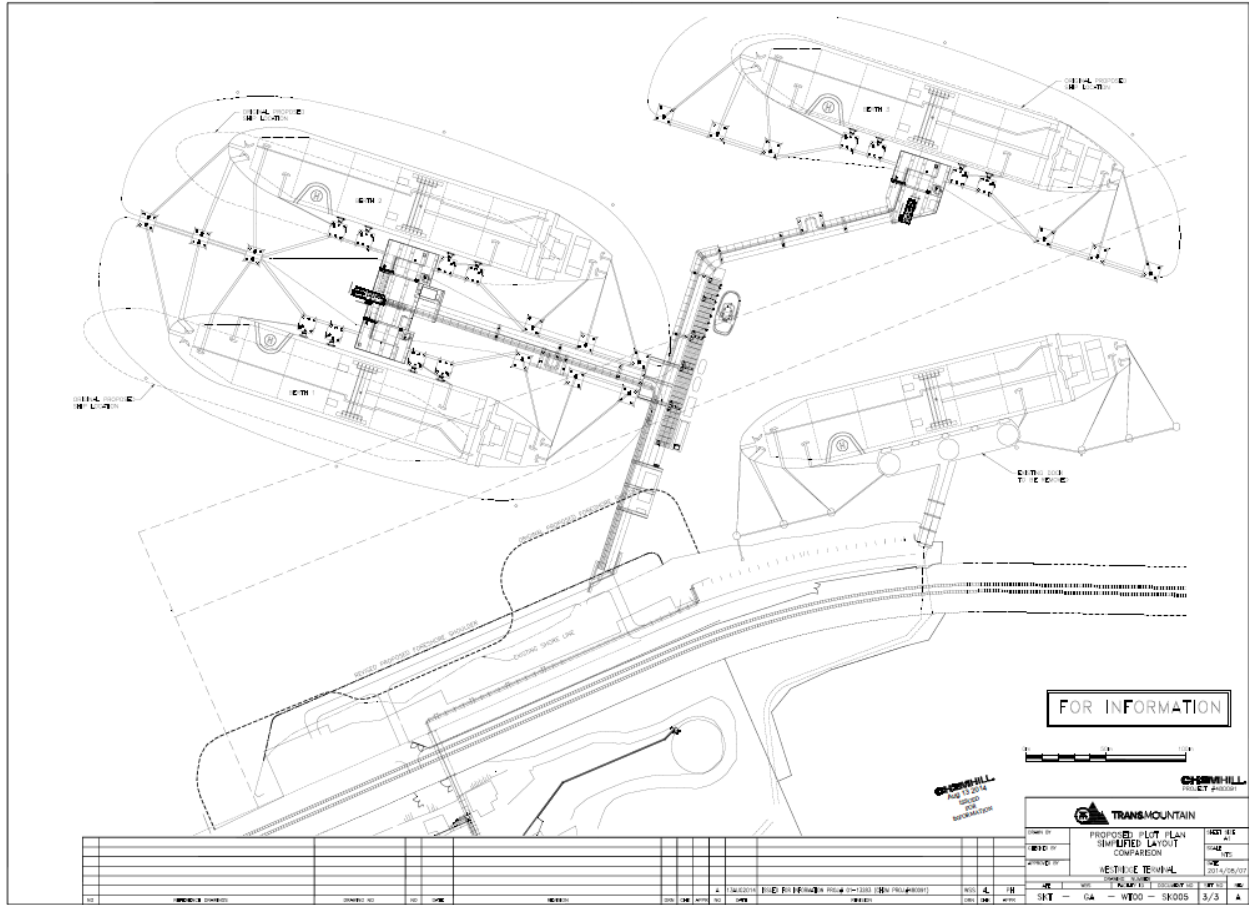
Westridge Terminal – Proposed Plot Plan, Simplified Layout Comparison
